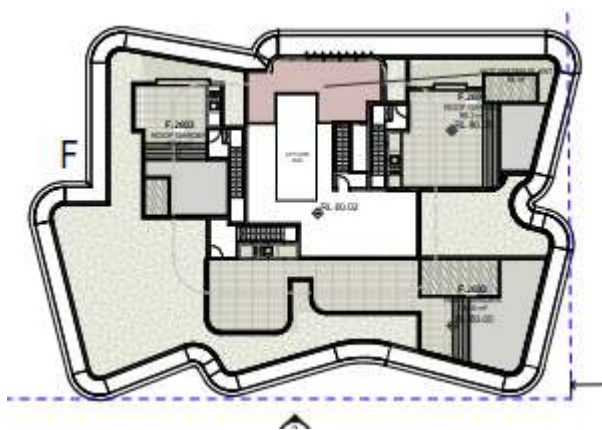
Architectural Views of the Proposed Development – Level 26 (Roof Building F)
